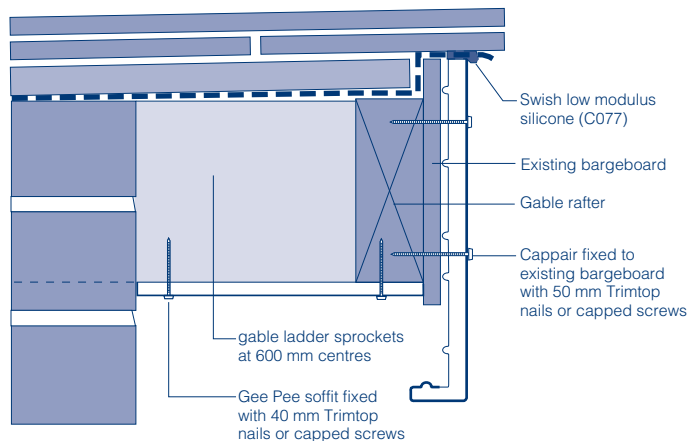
Cappair used with gable ladder and recessed Gee Pee soffit
